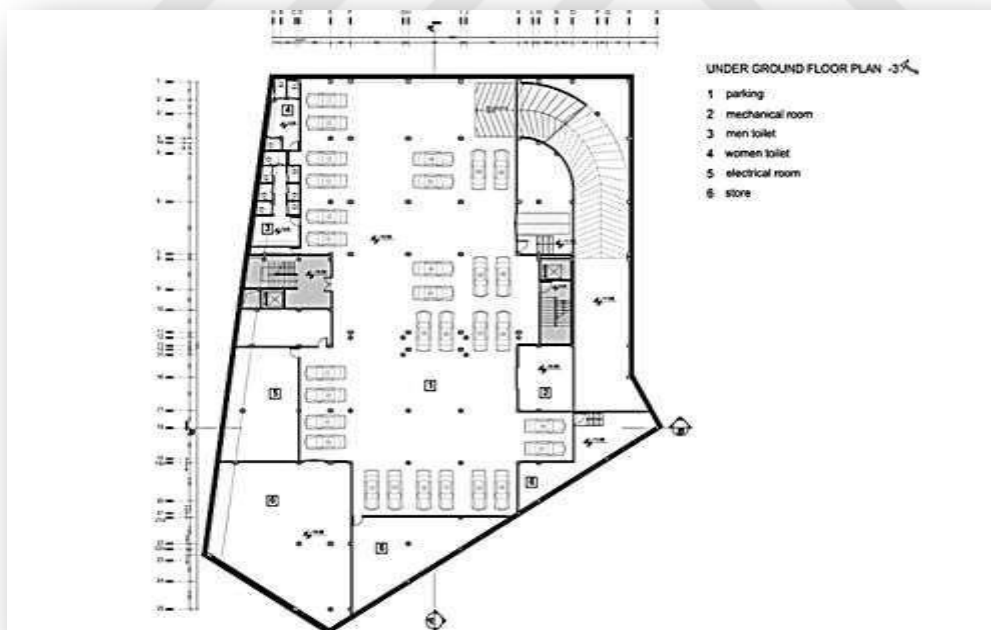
Underground Floor Plan. Kalout Architect Studio, 2012, Retrieved from https://kaloutarch.com
